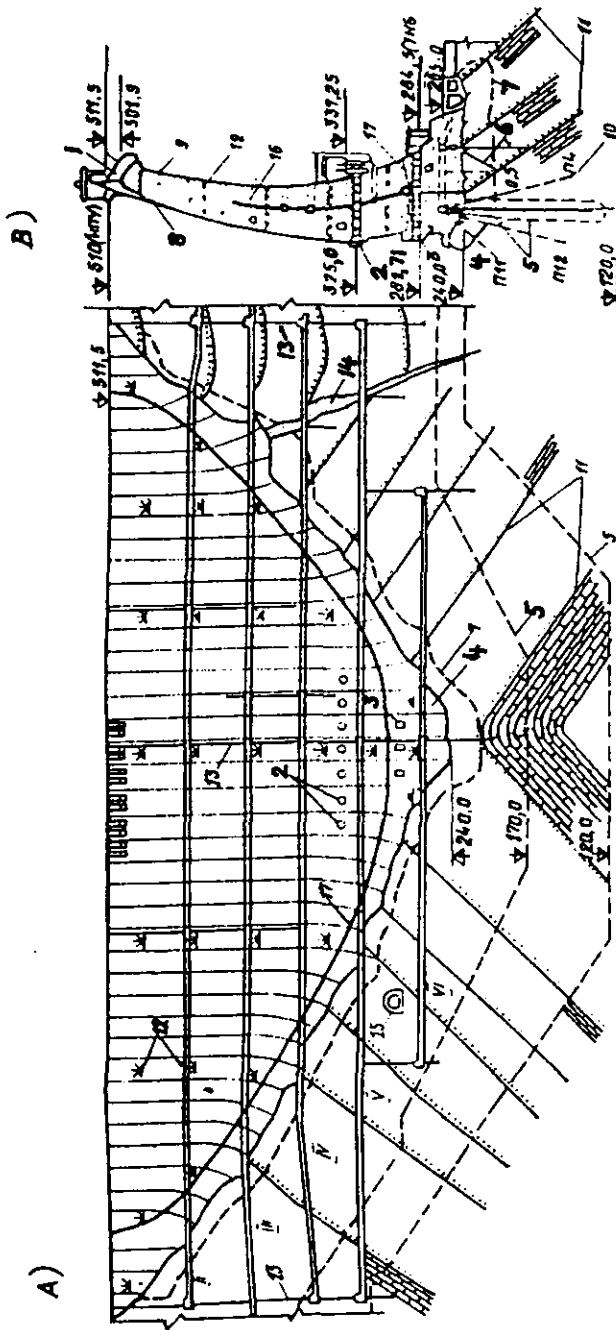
Arch dam; A) development along the axis of grout curtain; B) crown block; 1) crest spillway; 2) low level outlet; 3) construction outlet; 4) saddle; 5) grout curtain; 6) curtain drain; 7) boundary of blanket grouting; 8) tracks of leaning gate; 9) service catwalks; 10) piezometers; 11) tectonic fractures; 12) points of monitoring stress-strain state of dam; 13) plumbline; 14) sealing of fault; 15) construction tunnel; 16) longitudinal joint; 17) perimetral joint; I-IV horizons of service galleries and tunnels.
